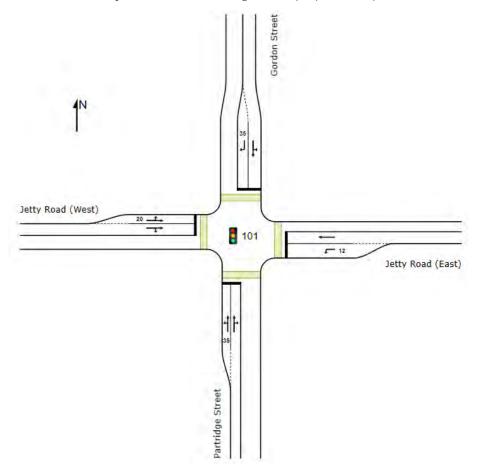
Gordon Street, Partridge Street and Jetty Road Junction Layout - All Options
